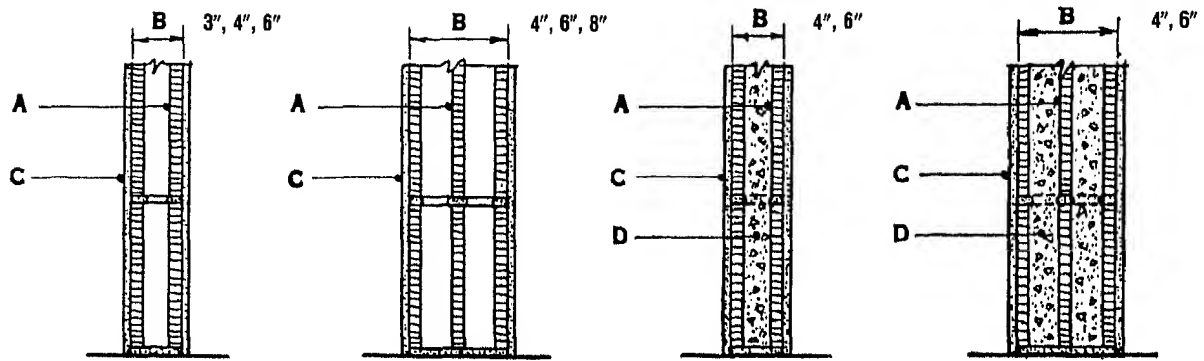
Structural clay tile: nonbearing (sections). A = structural clay tile, B = nominal wall thickness, C = finish, D = fill.
